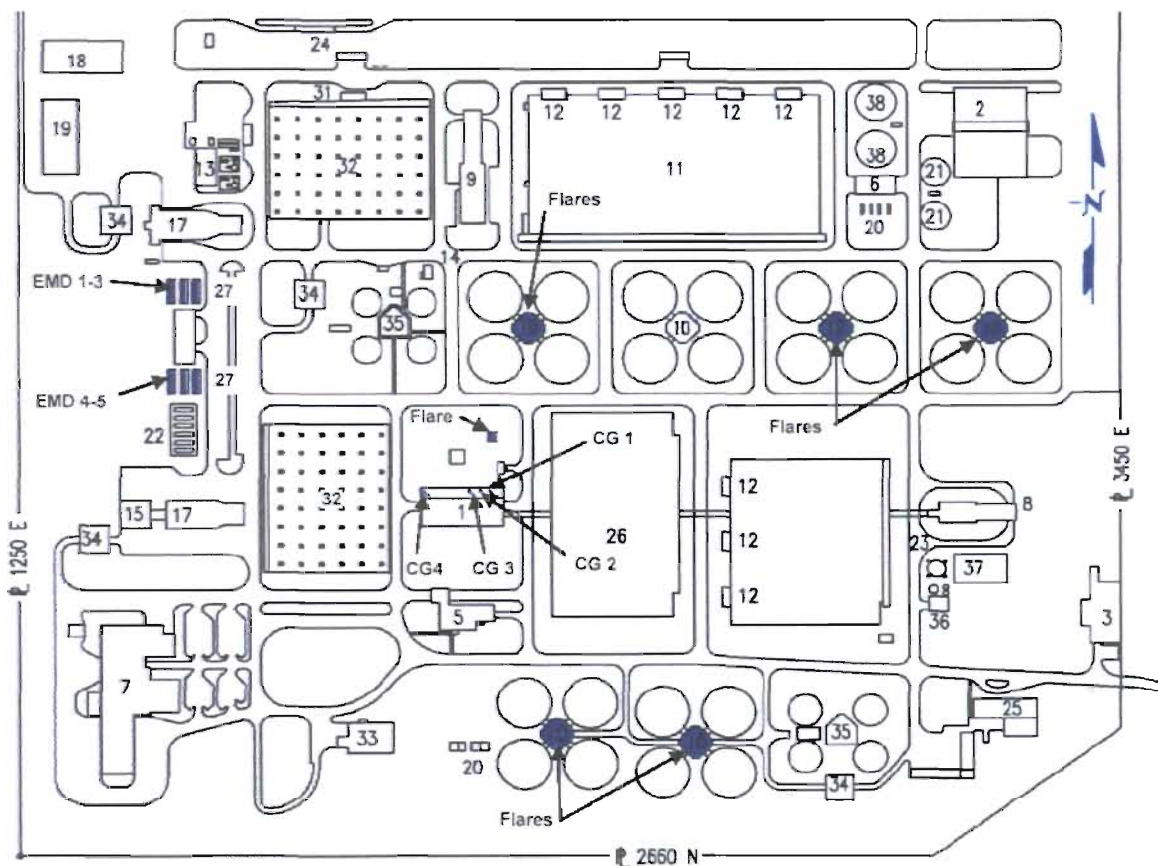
Partial Facility Plot Plan of the Central District Wastewater Treatment Plant
